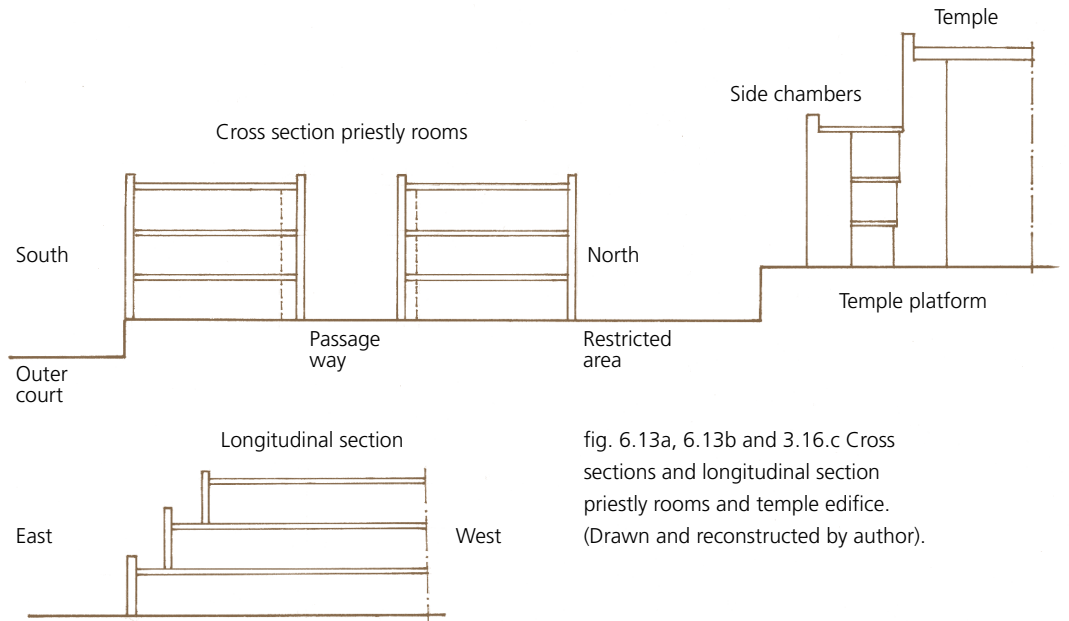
, 6.13b and 3.16.c Cross sections and longitudinal section priestly rooms and temple edifice. (Drawn and reconstructed by author).
